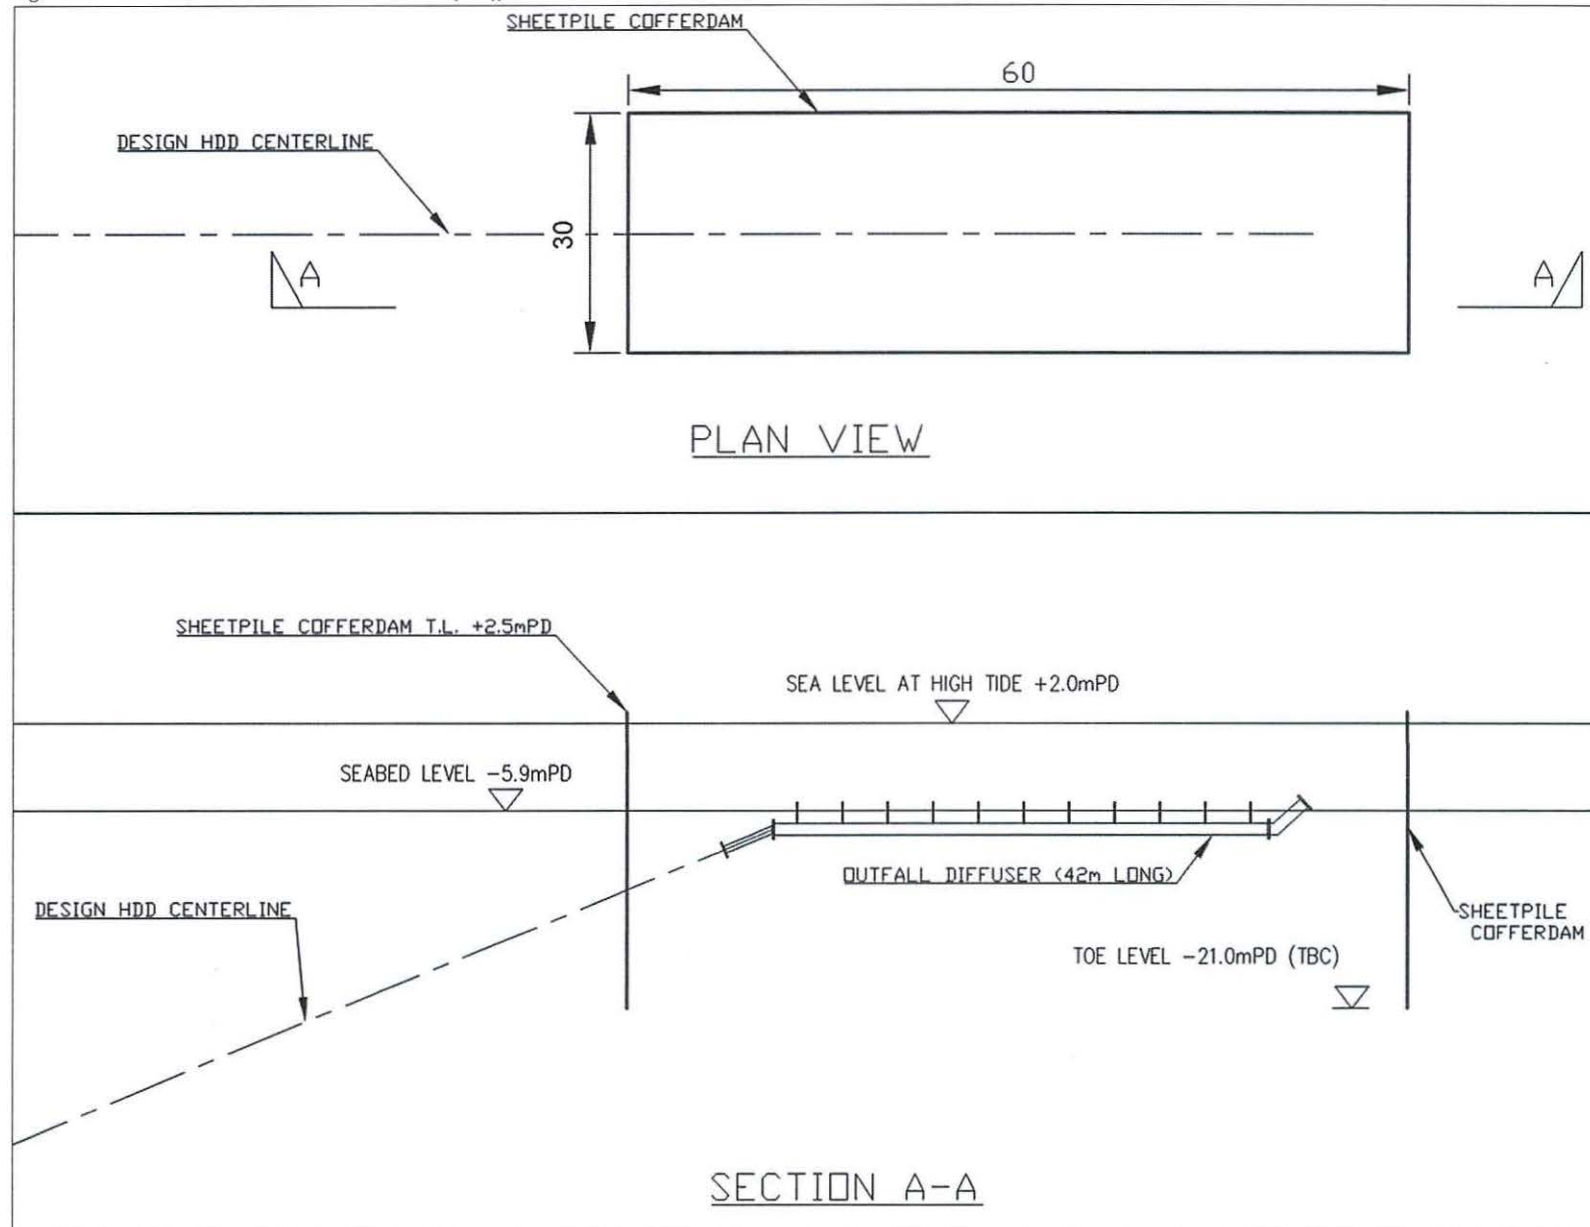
Cross-sectional View and Plan View of Cofferdam
